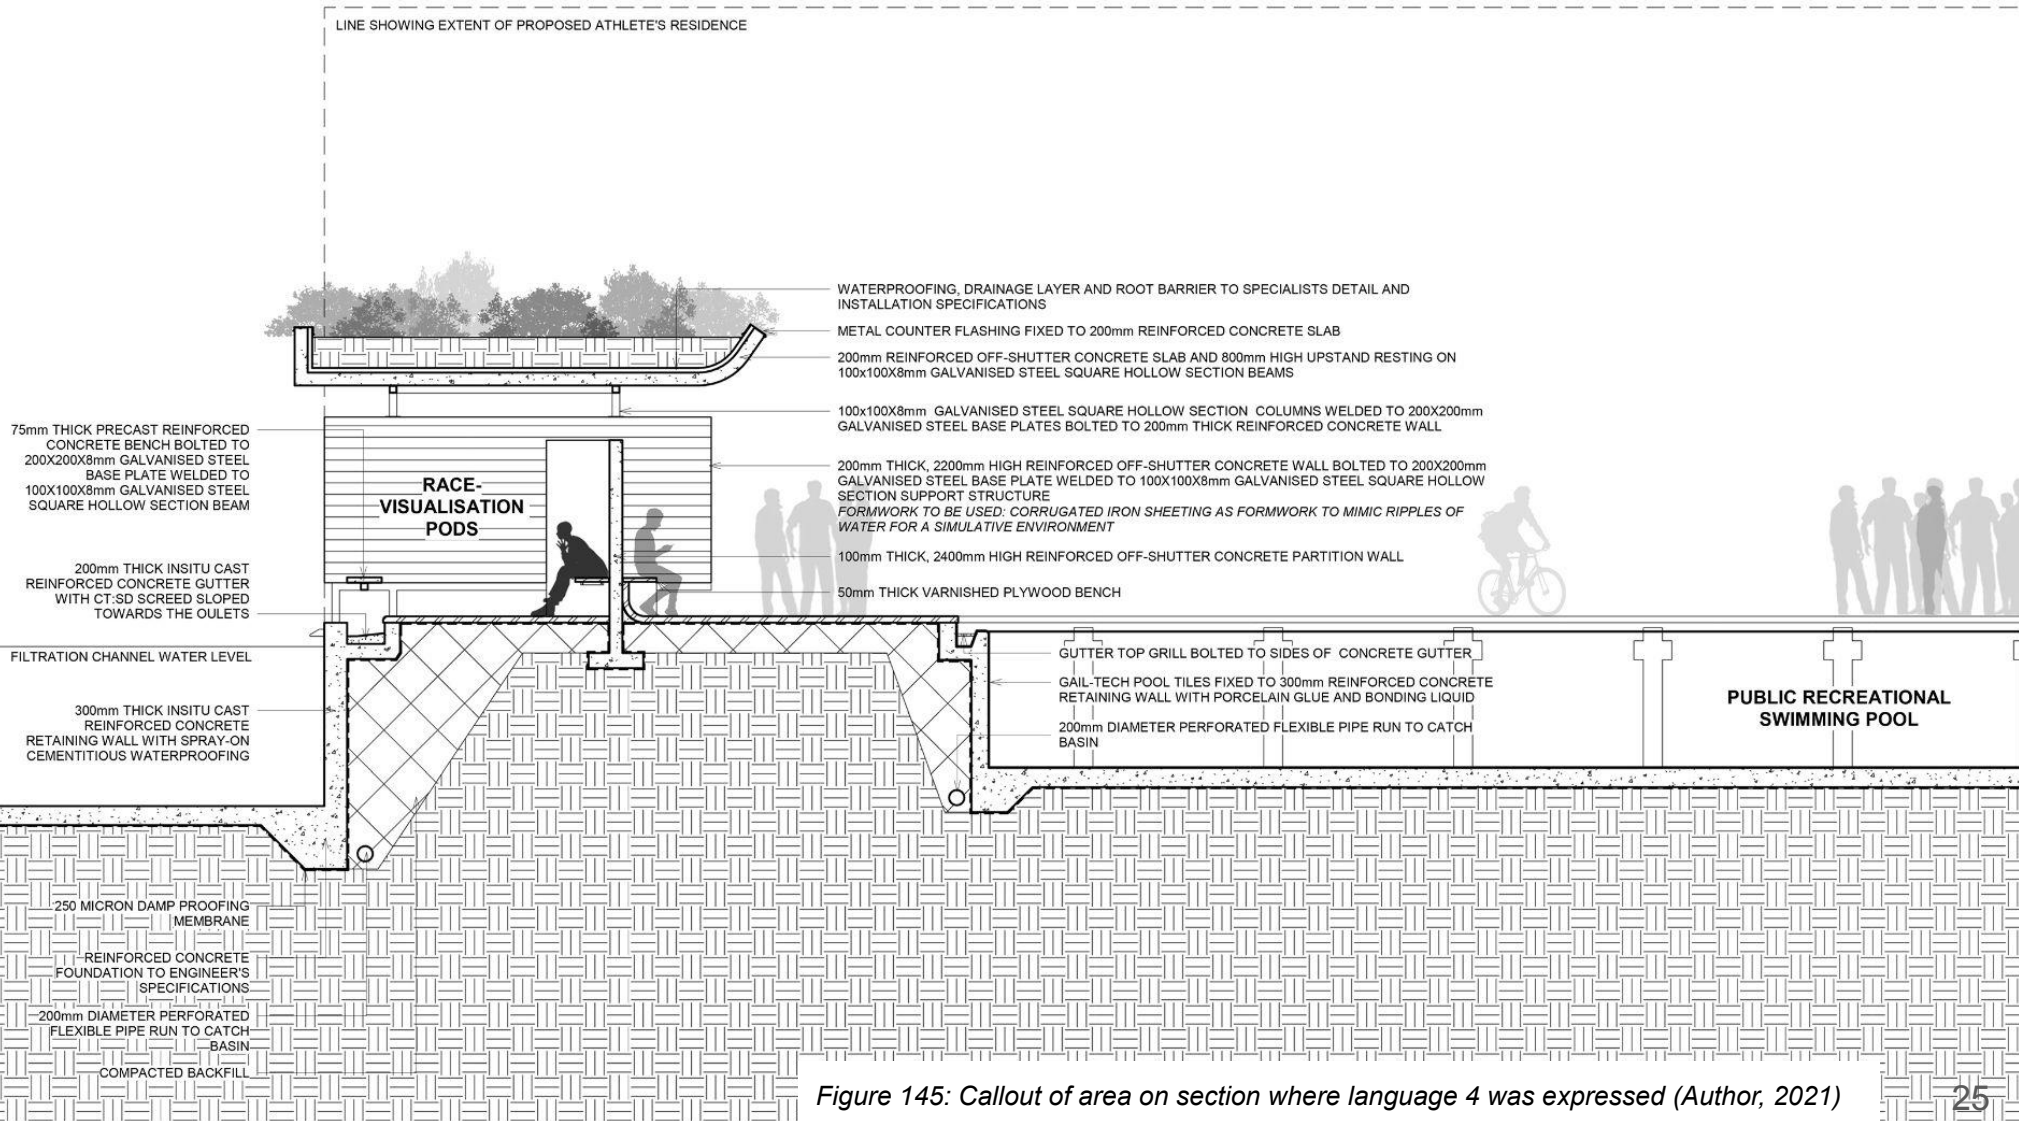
Callout of area on section where language 4 was expressed (Author, 2021)
